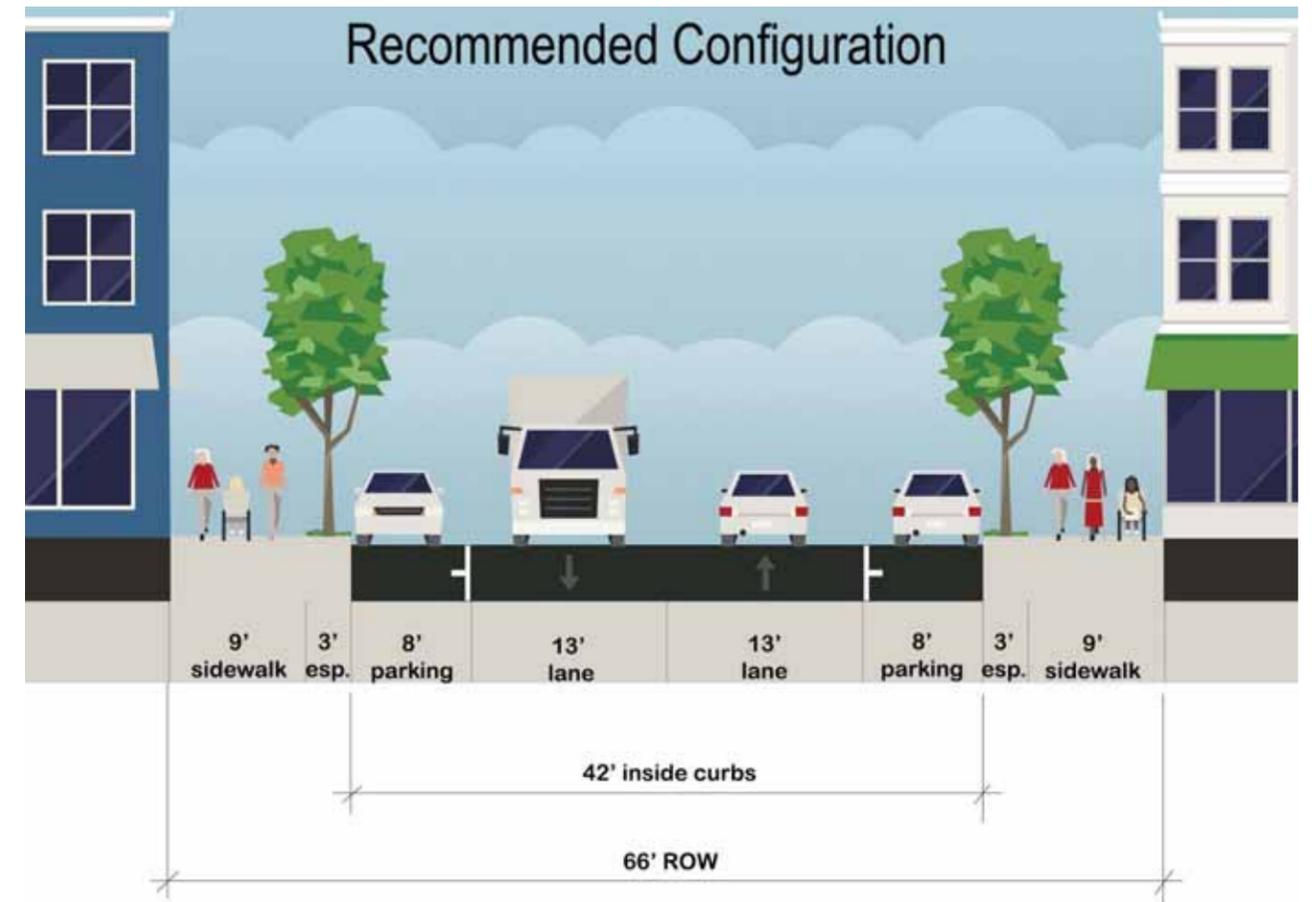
Washington Avenue between Fox Street/Walnut Street and Cumberland Avenue
